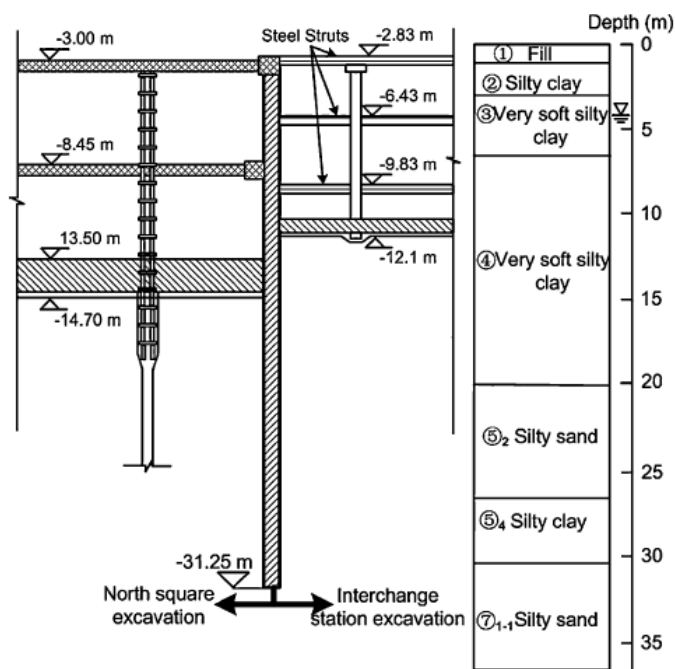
Section view of the Exchange Station excavation (Hou, Wang et al. 2009)
